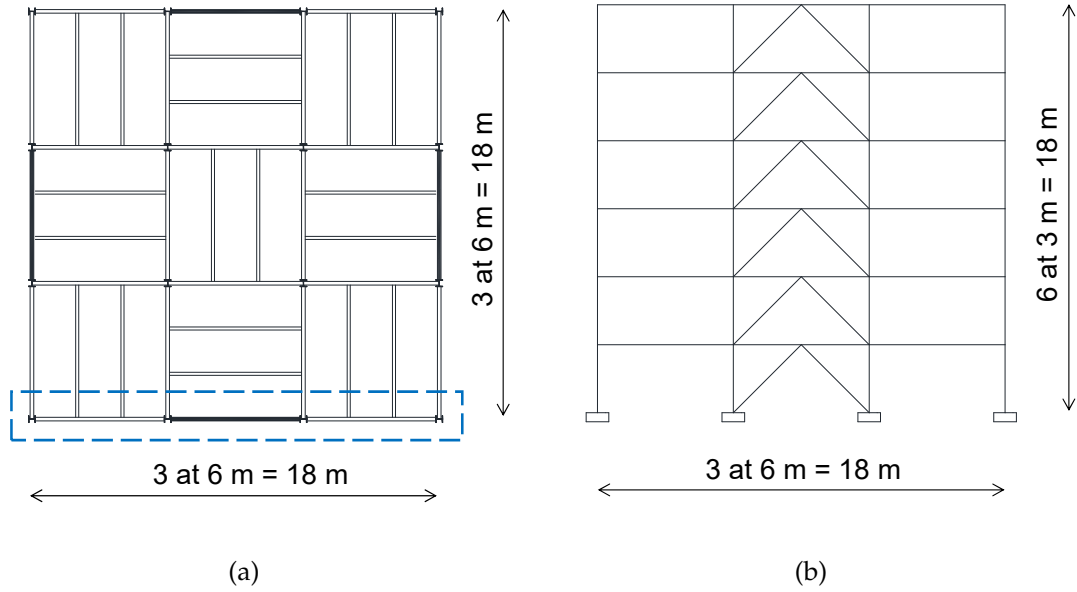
Prototype building: (a) plan view; and (b) elevation of a perimeter frame
